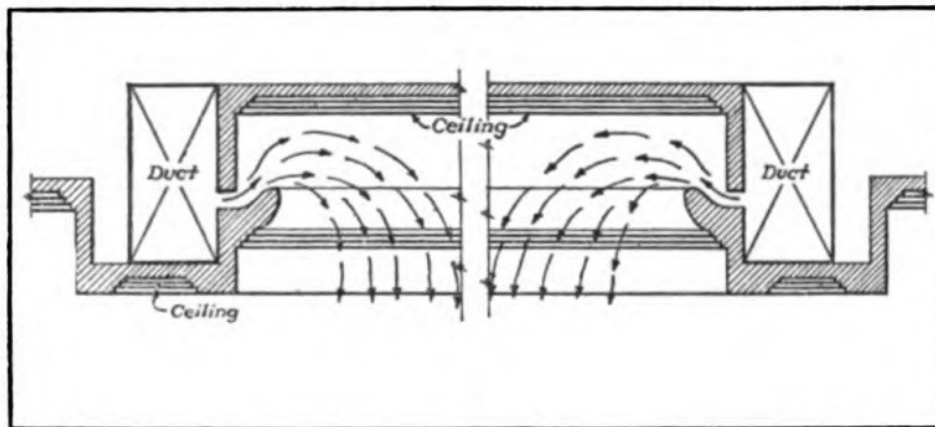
Typical detail of a slot in the ceiling for introducing air
